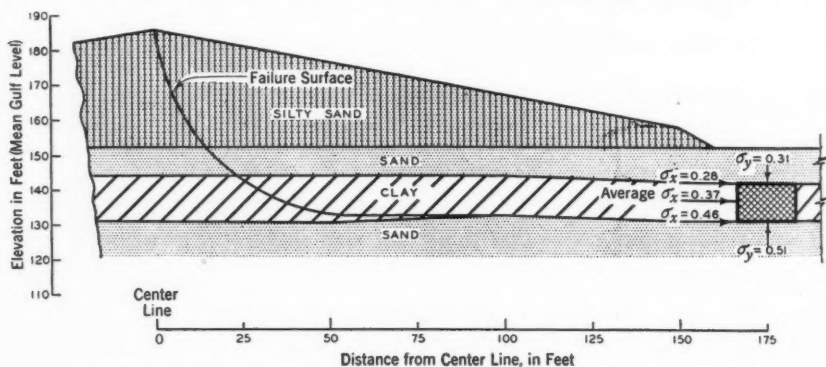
STABILITY OF THE TOE SECTION, 175 FT ON THE LAND SIDE, AT STATION 1844 + 50, FEBRUARY 14, 1940
